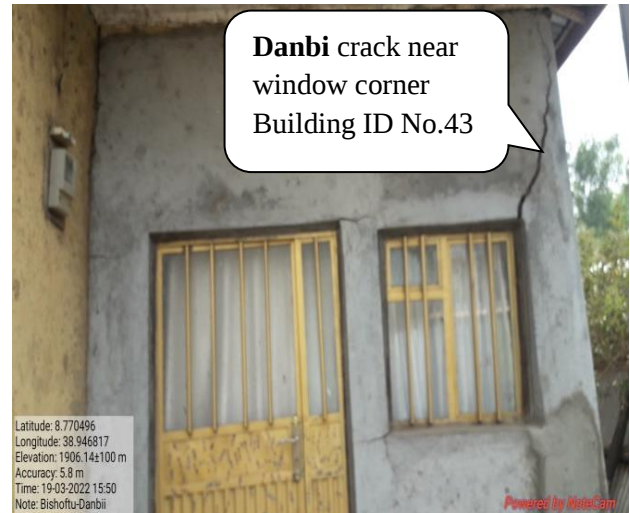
12: Damage of some inspected buildings with type of building and its elements.
